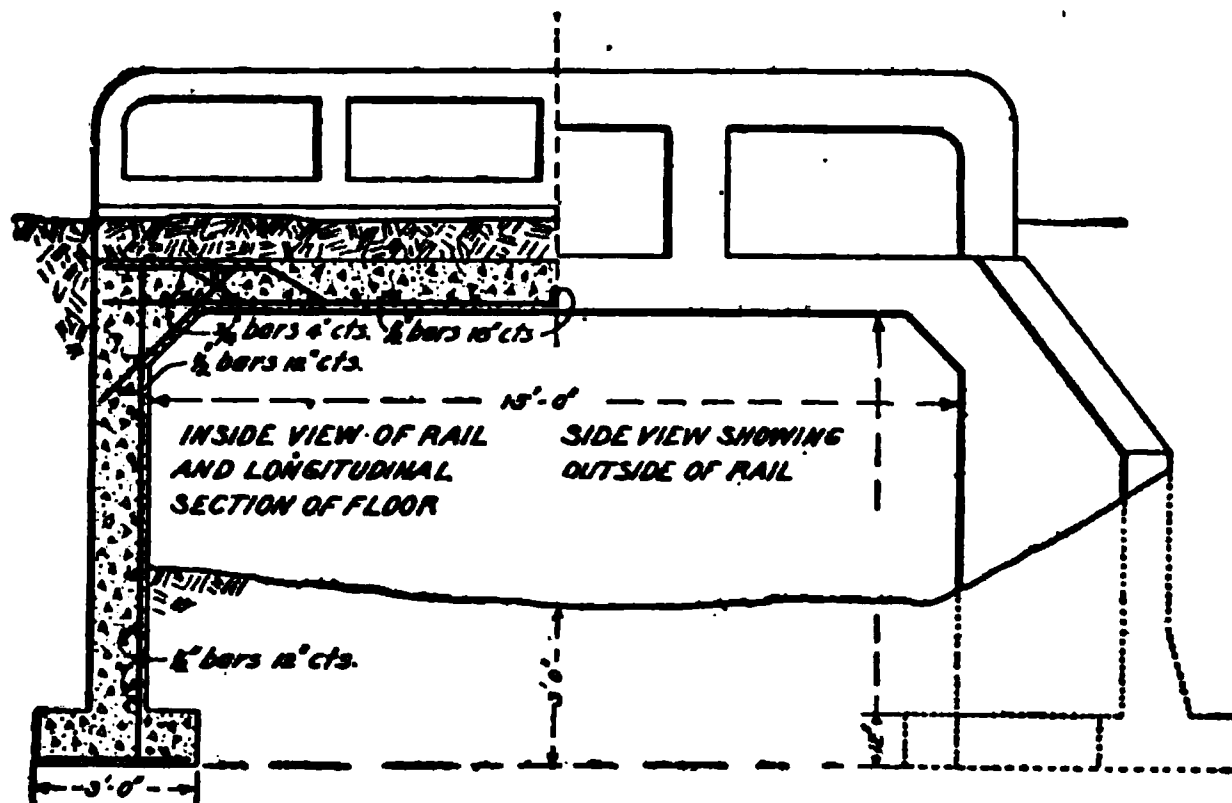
FIFTEEN-FT. SPAN REINFORCED CONCRETE BEAM HIGHWAY BRIDGE.
